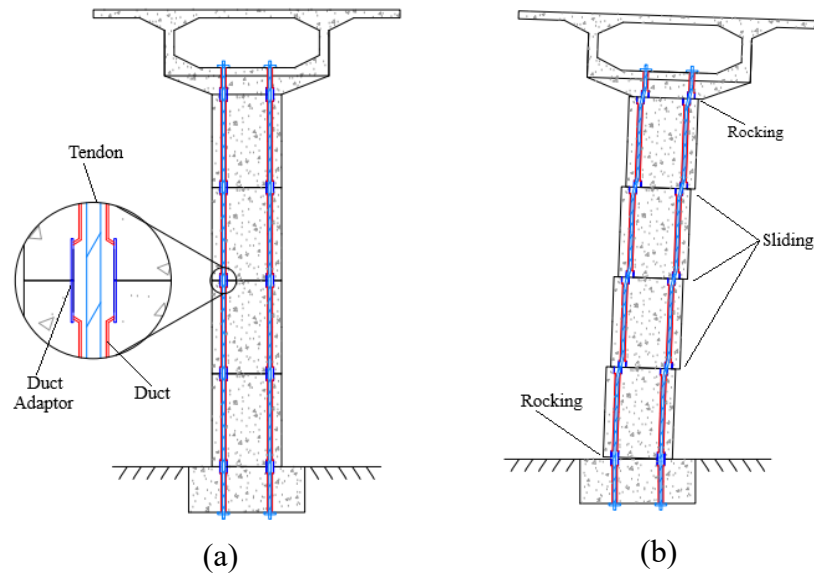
HSR bridge column (a) undeformed state; (b) deformed state [adapted from Sideris et al. (2014a)]
